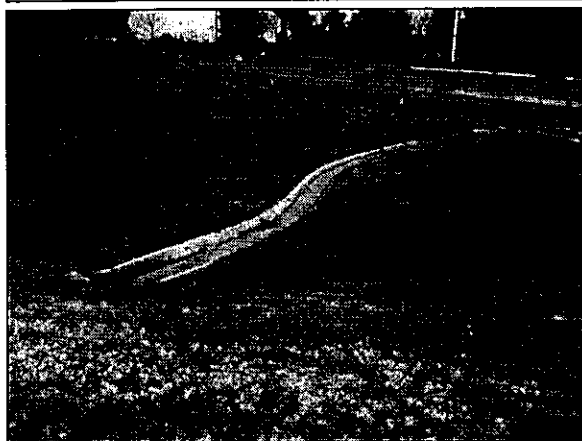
Concrete drainage swale between the stormwater impound west of the townhouse and Baron Cameron.
